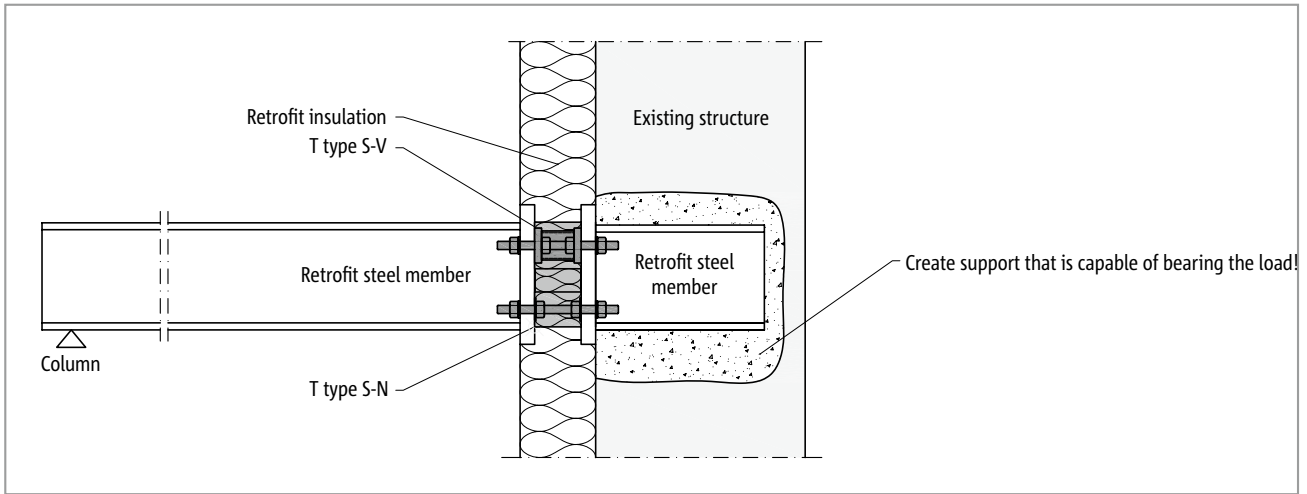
Schöck Isokorb® T type S-N and T type S-V: Retrofitted supported steel balcony connected to retrofitted wall support
